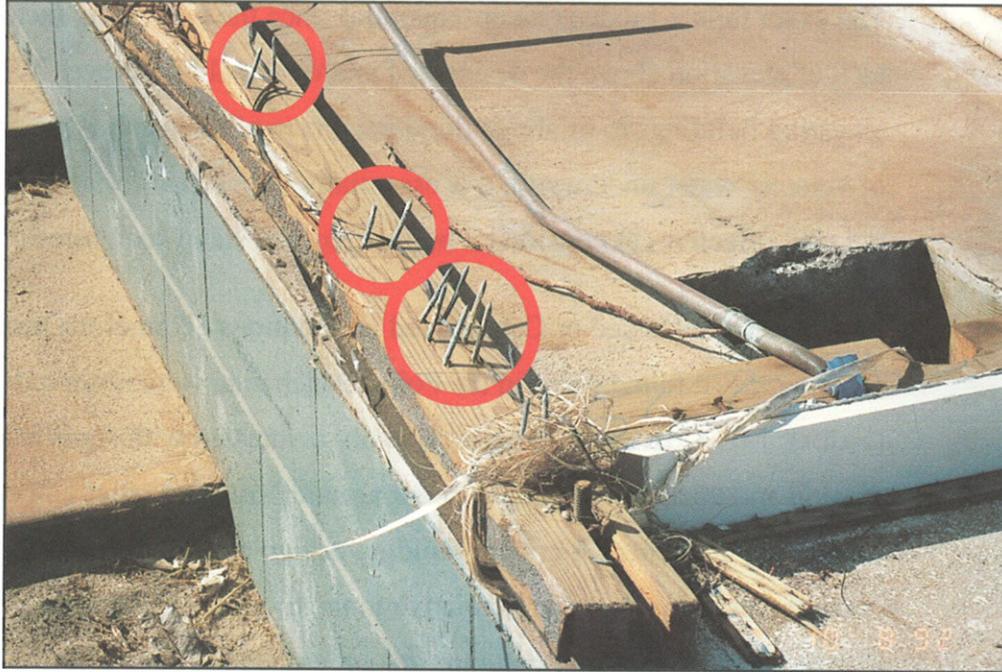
Non-elevated building at Poipu Beach destroyed by coastal flooding. Vertical members ripped from sill plate.
